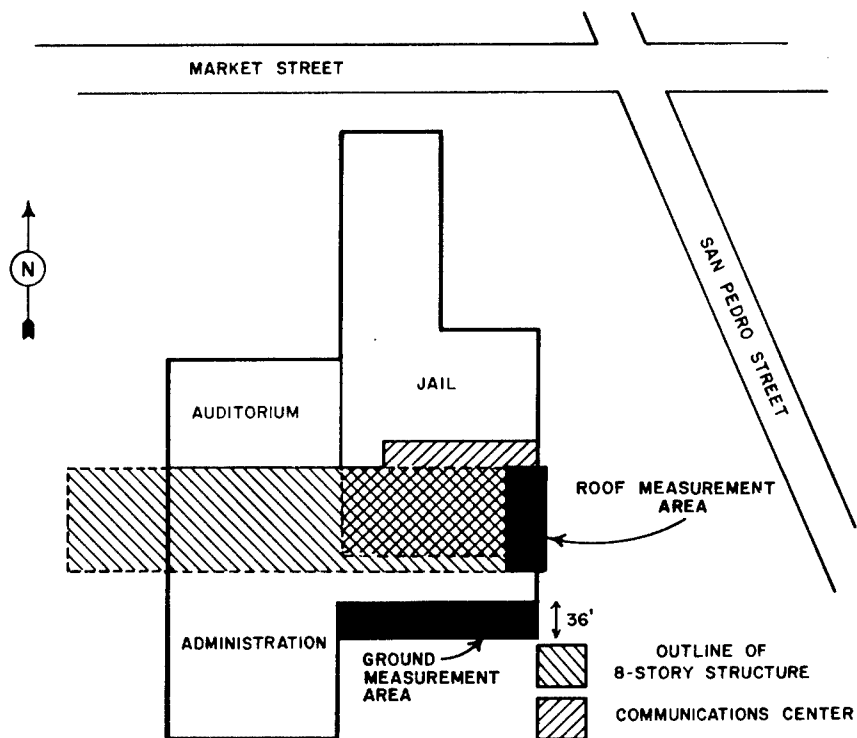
Tubing placement locations at Los Angeles Police Department building.
